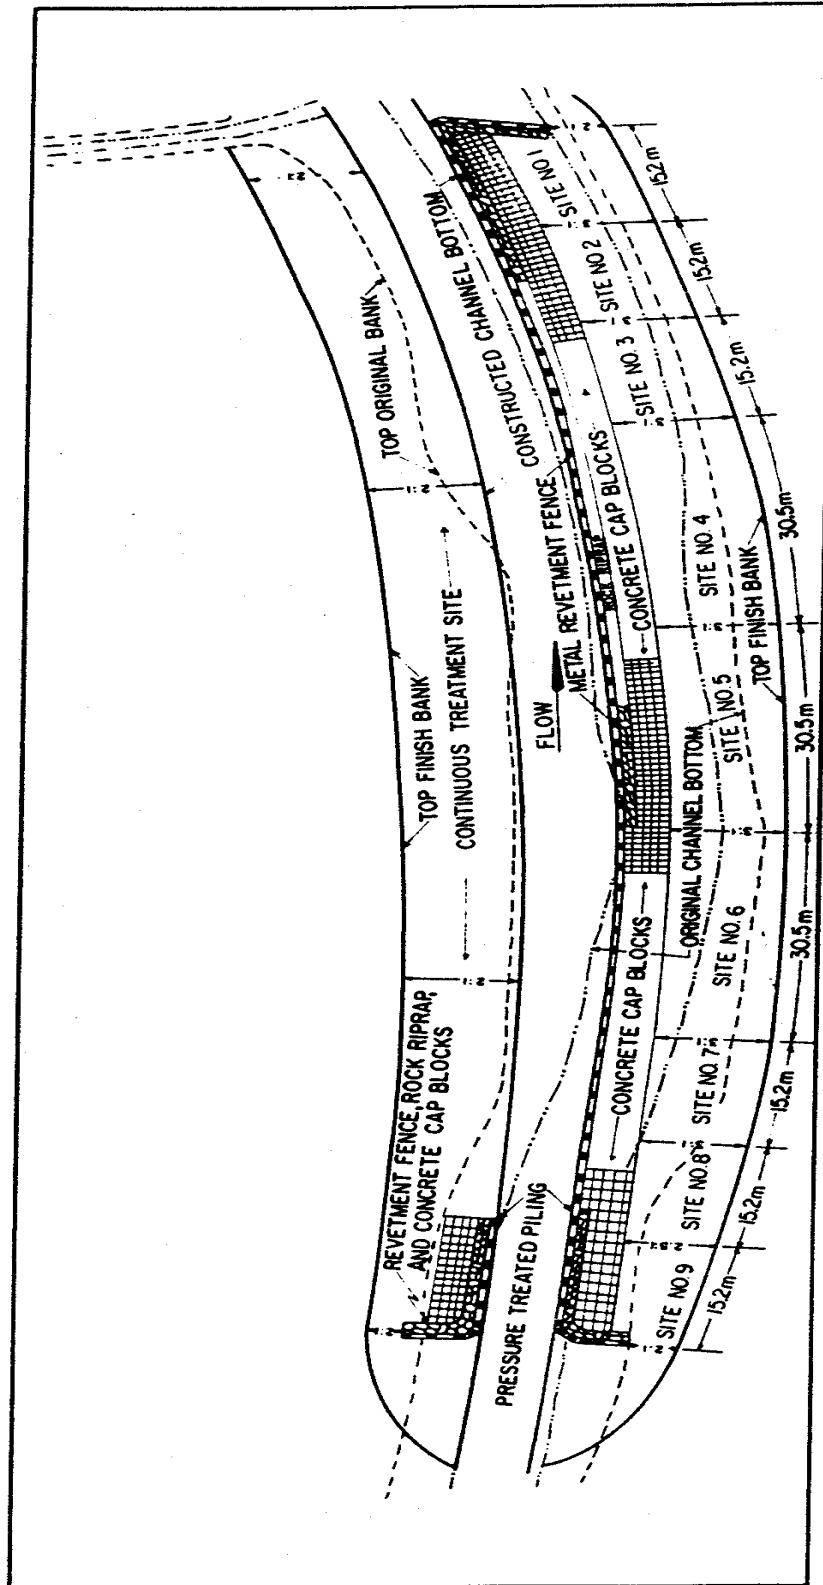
Site Plan of Johnson Creek Study Reach No. 1
